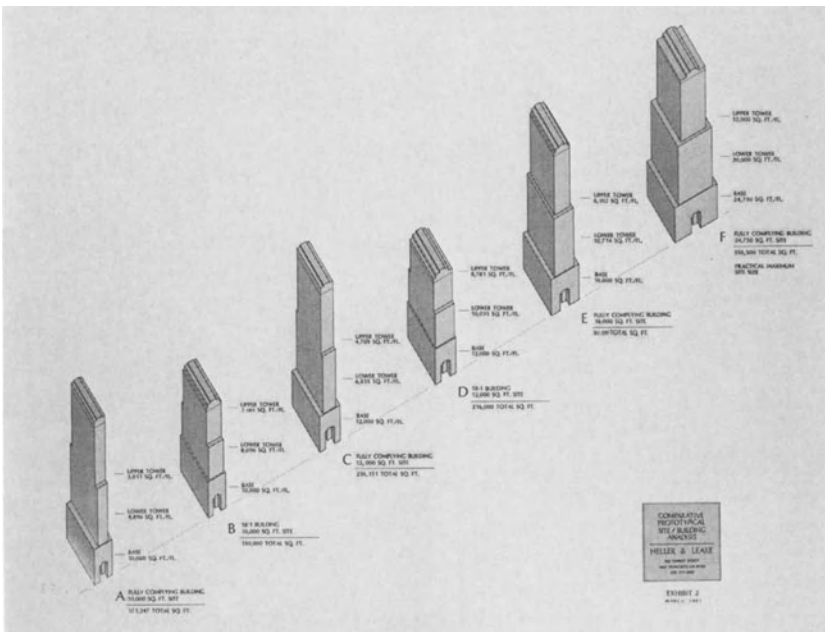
Comparative prototypical site/building analysis subject to Downtown Plan controls
